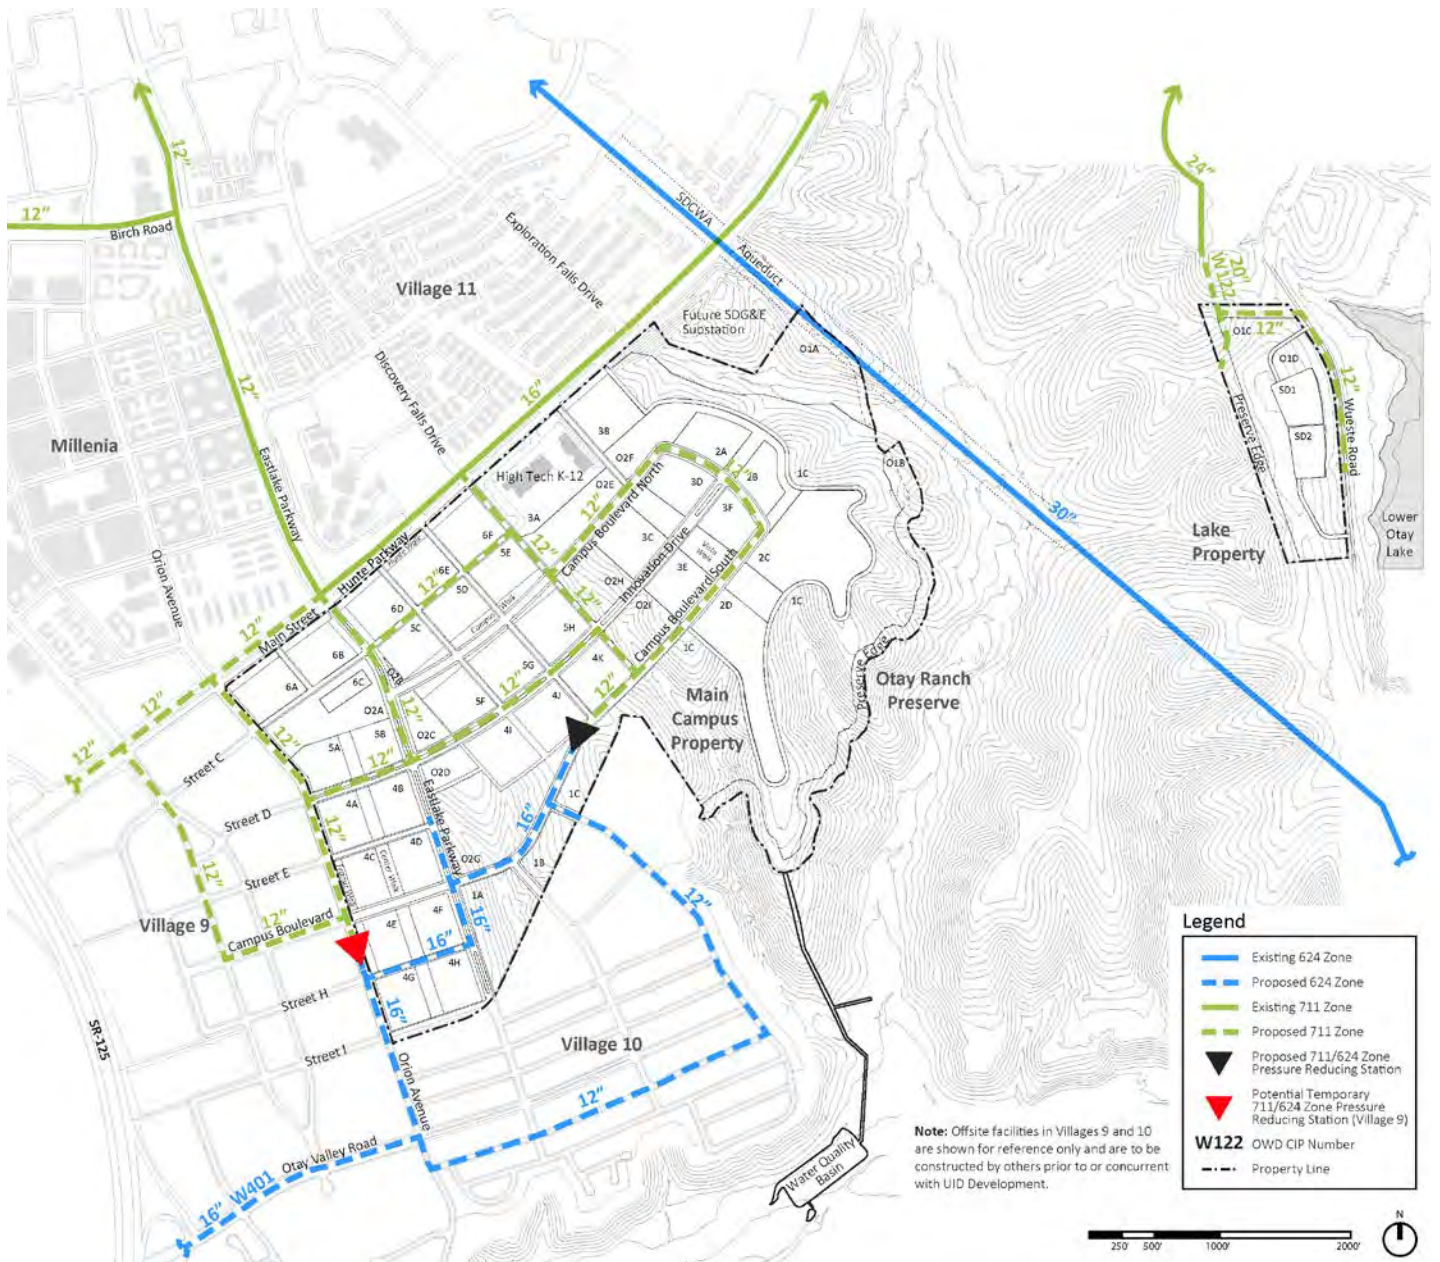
B: CONCEPTUAL POTABLE WATER PLAN
